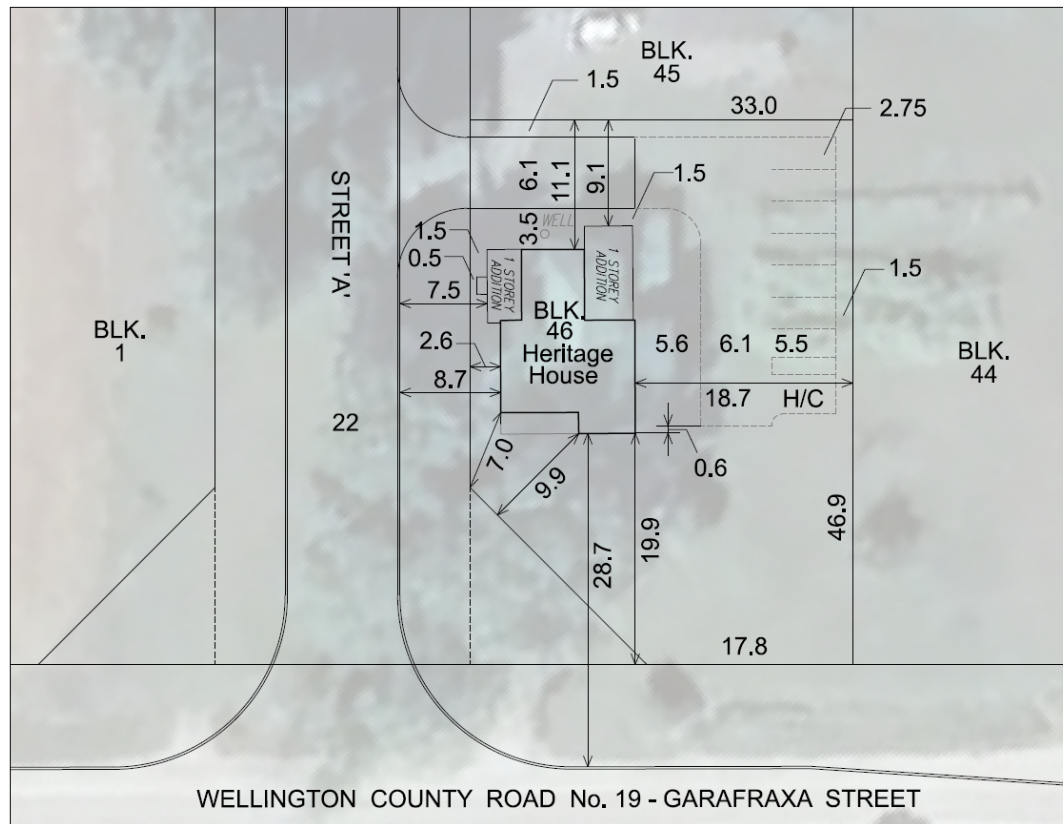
Detailed Site Plan for Subject Site (Source: Weston Consulting, 2026).
